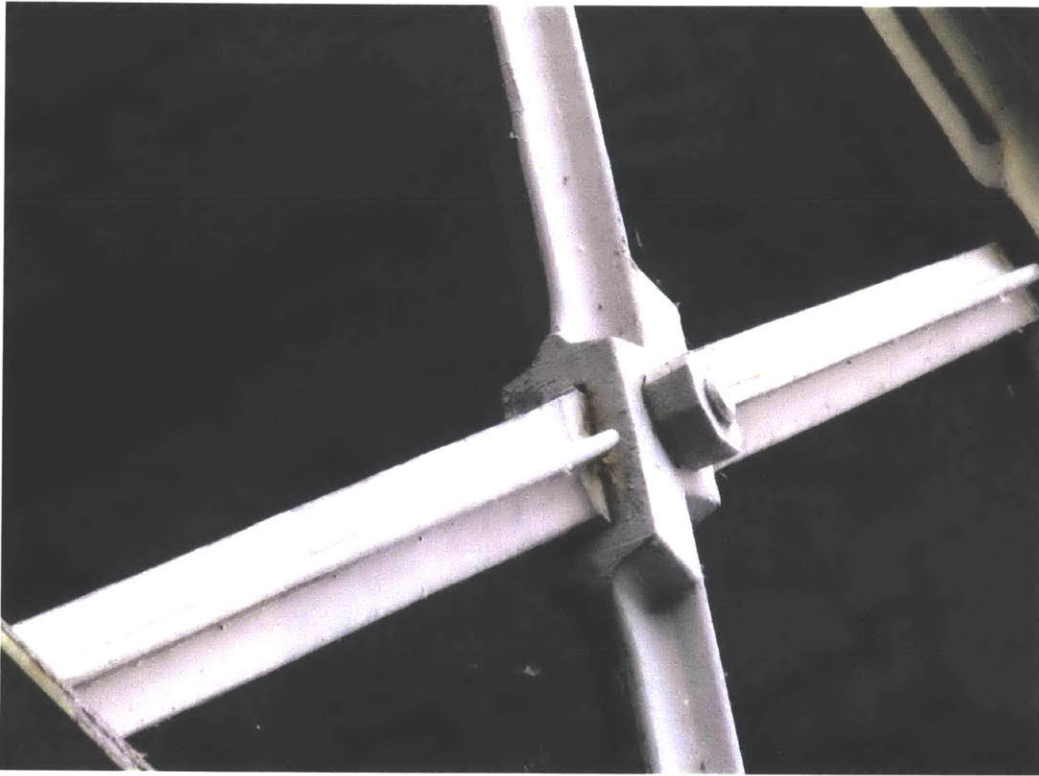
Closeup view of midspan connection - Mythe Bridge
